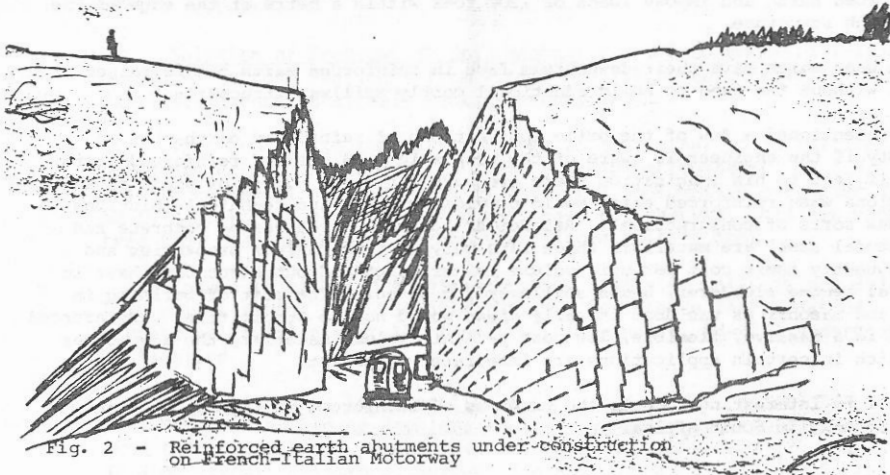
Reinforced earth abutments under construction on French-Italian Motorway
